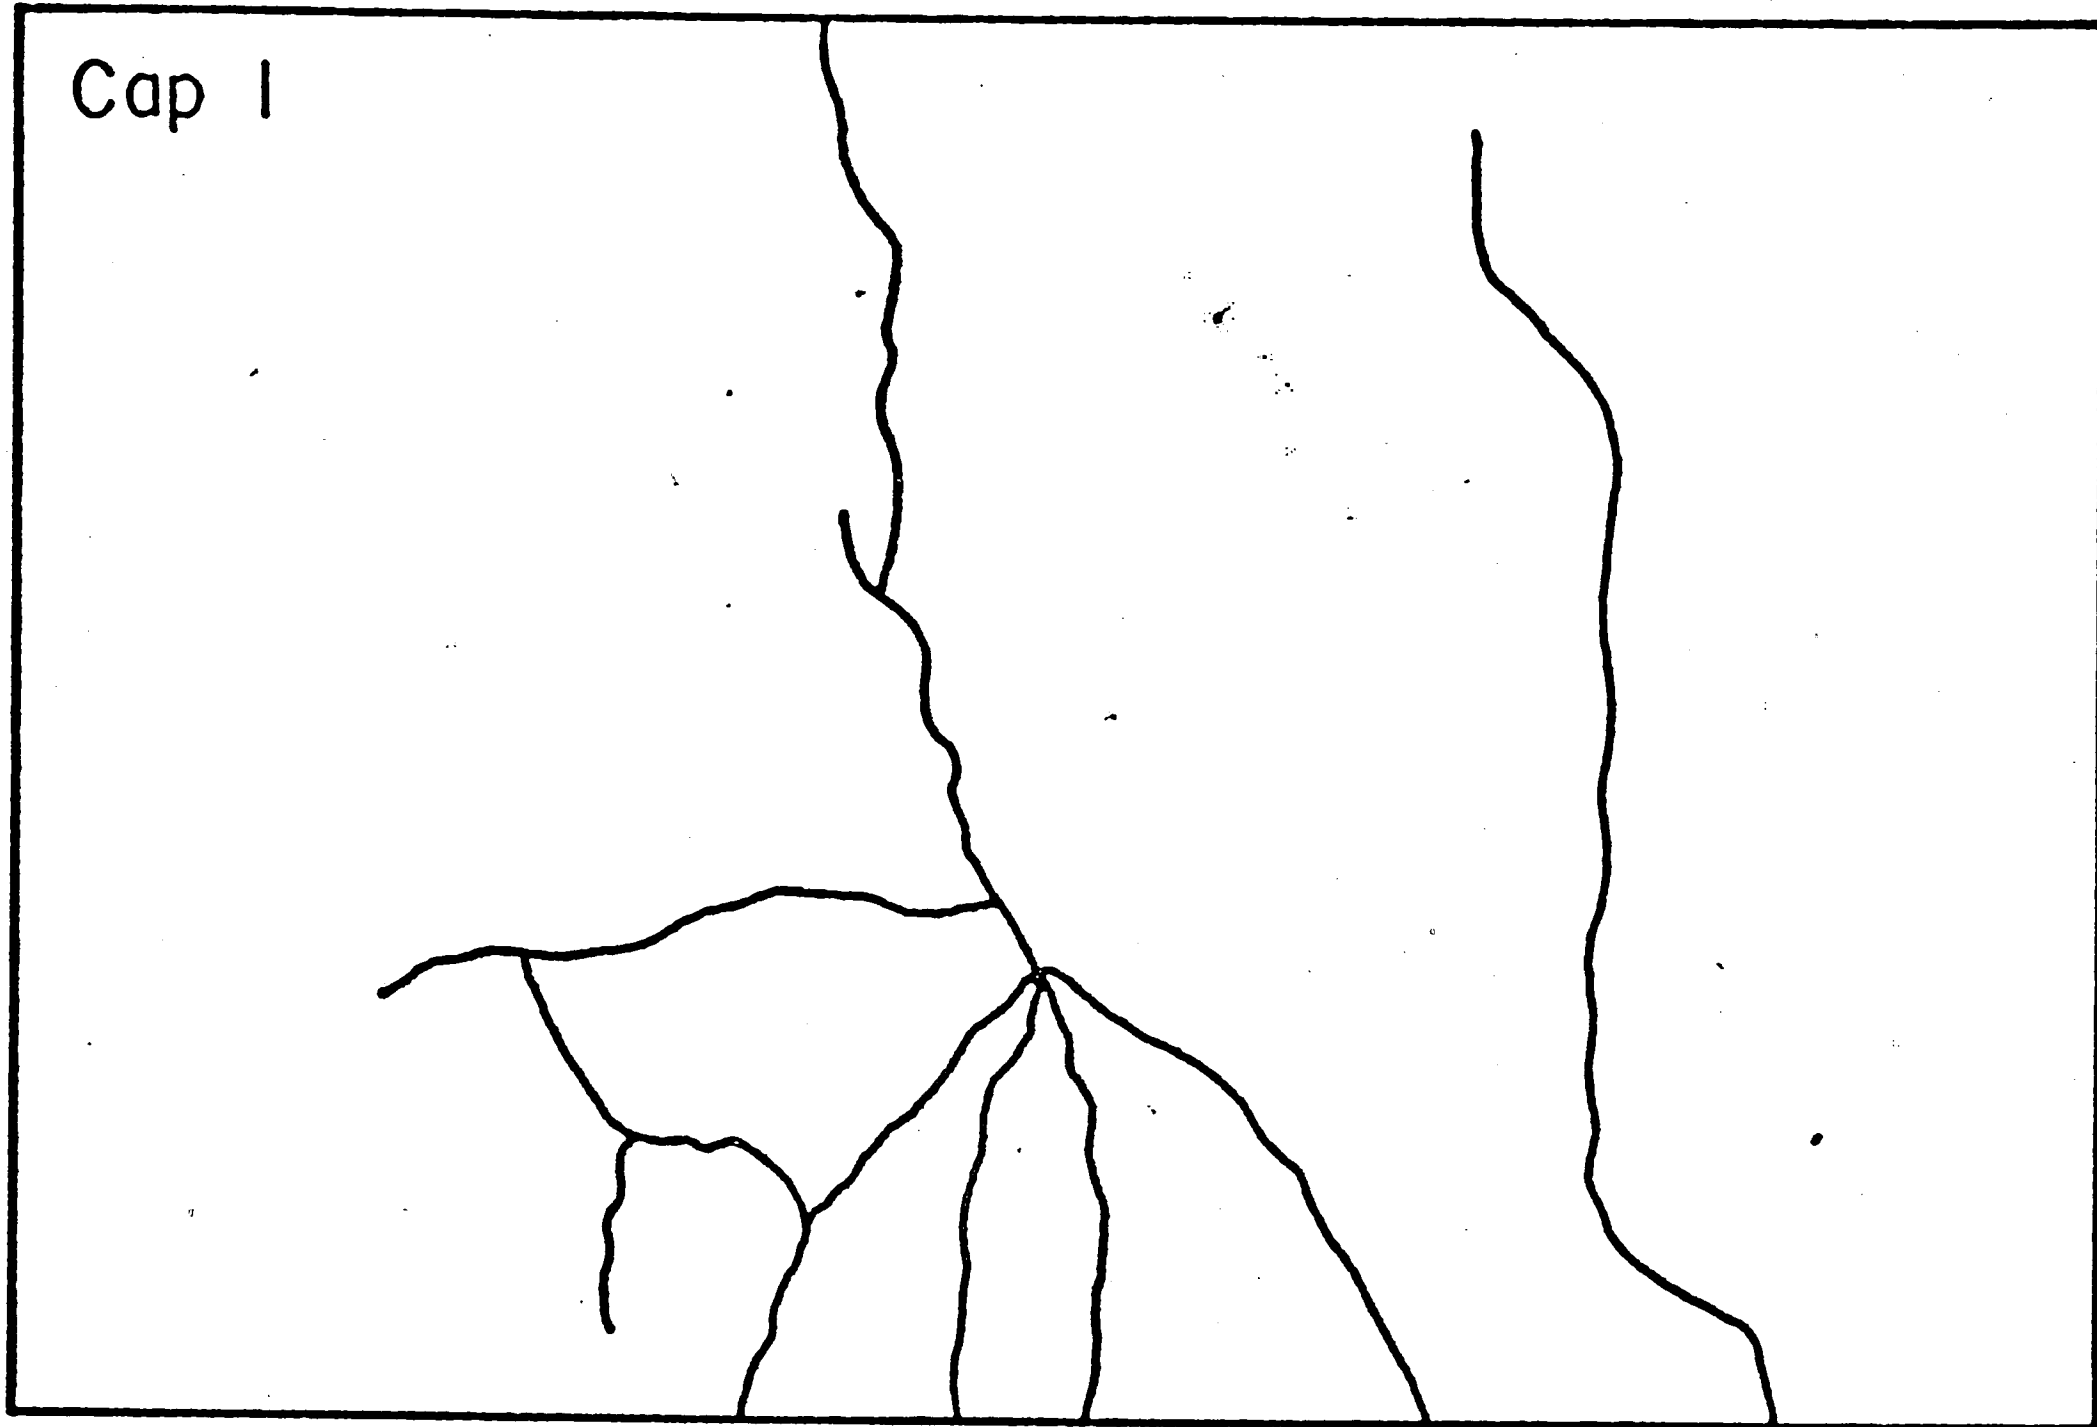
WEST END OF PILE CAP 1 - CRACK PATTERNS
